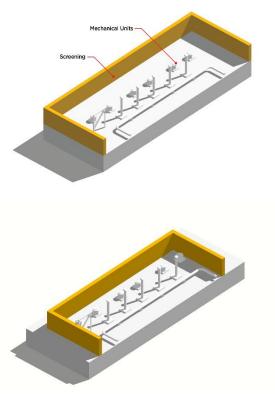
Rooftop Equipment - Parapet Wall or Central Corral
